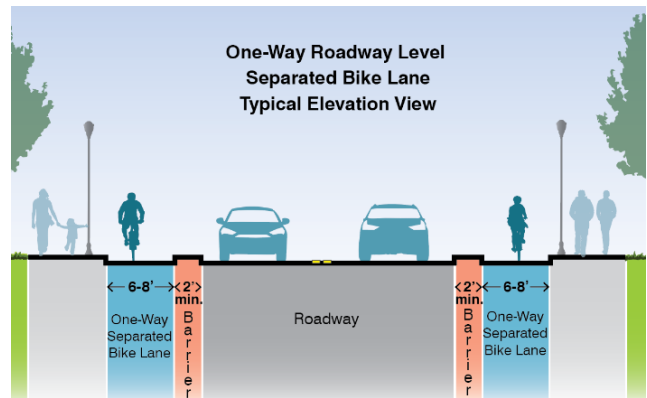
Paired One-Way Separated Bike Lanes at Road Level
